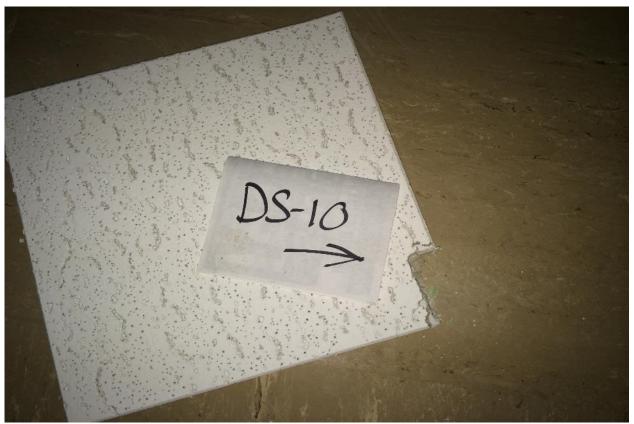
Laboratory analyses did not detect asbestos minerals within suspended ceiling tile sample DS-10 collected from the Dormitory Building upstairs dorm room.
